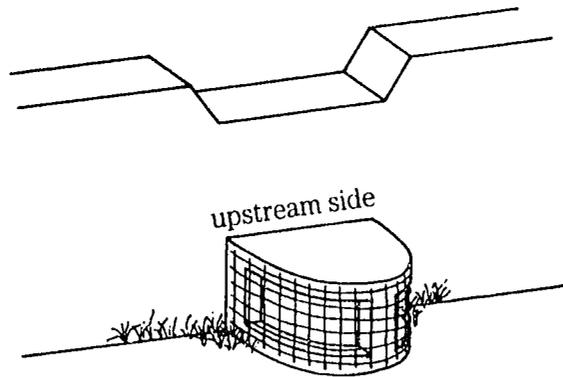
Flood detention dam with semi-circular opening and steel trashrack
